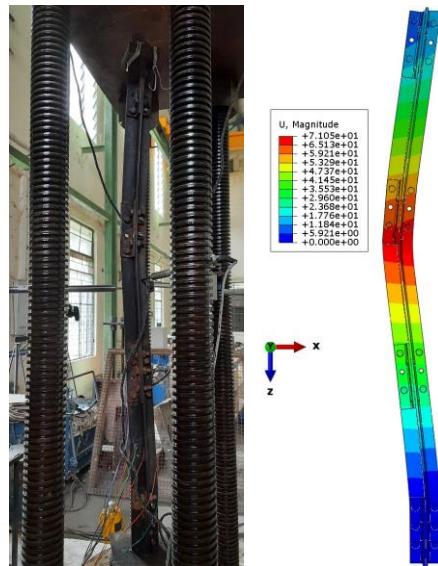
SR100 Deformed Shape (Exp-Numerical)
